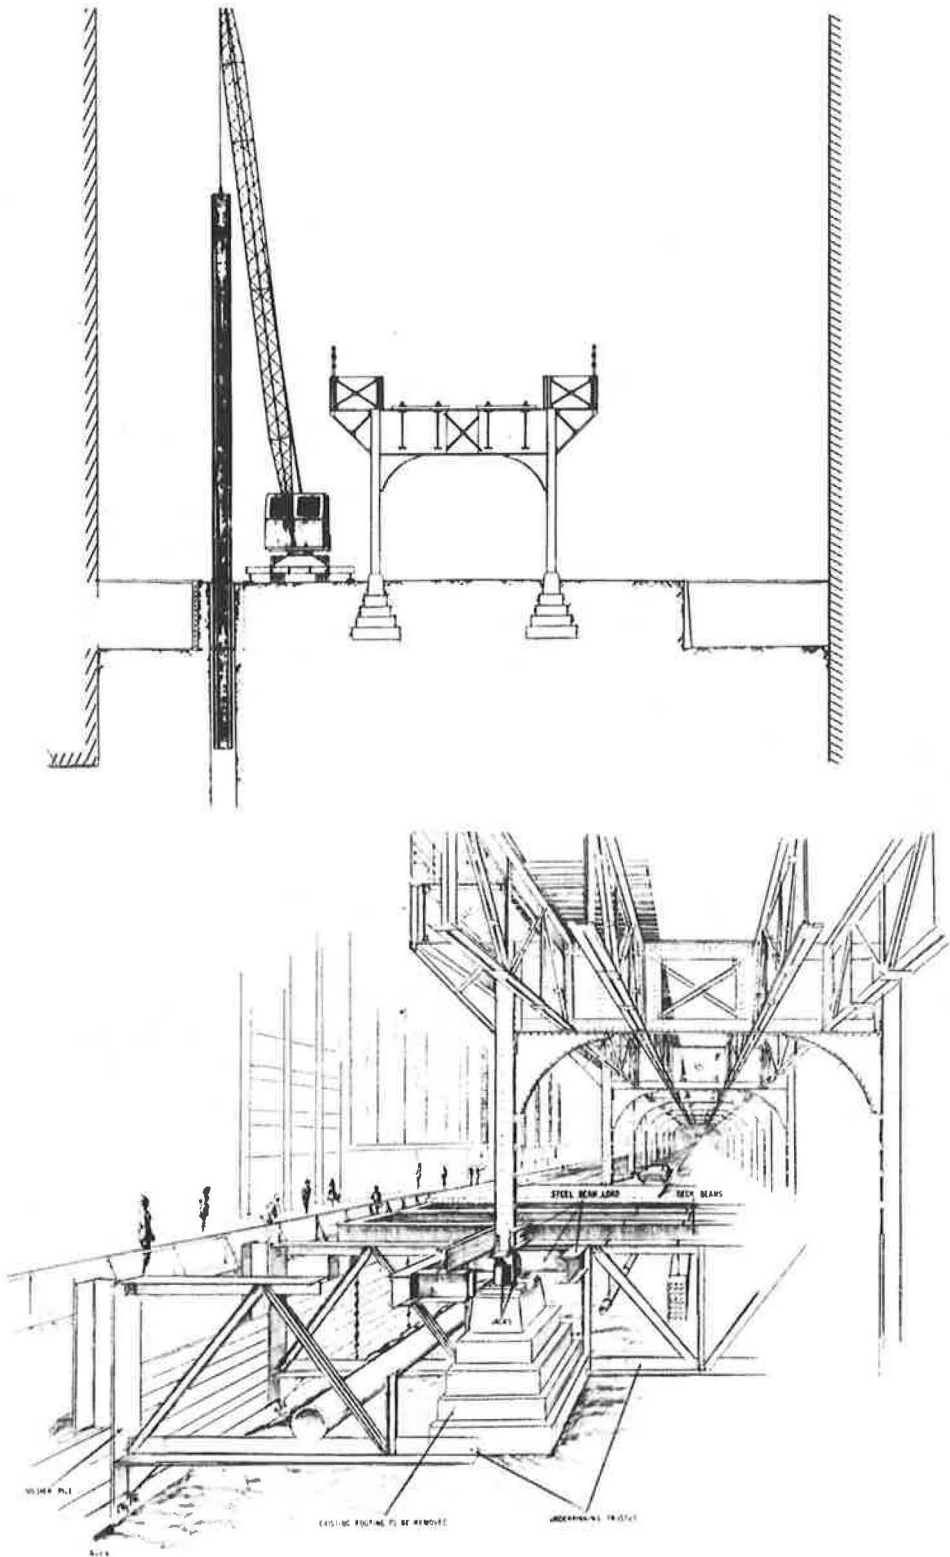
Placing soldier piles and underpinning elevated structure on Wabash Avenue.
